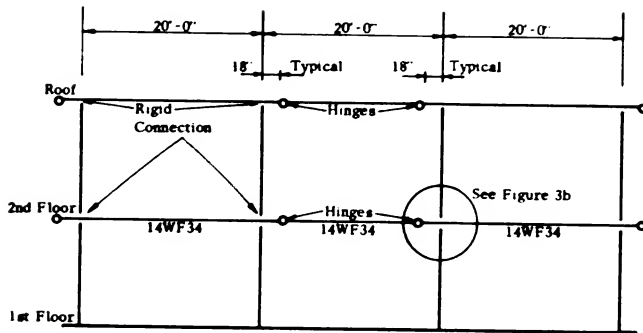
ELEVATION OF TYPICAL LONGITUDINAL RIGID FRAMES ON LINES A, B, C, & D
